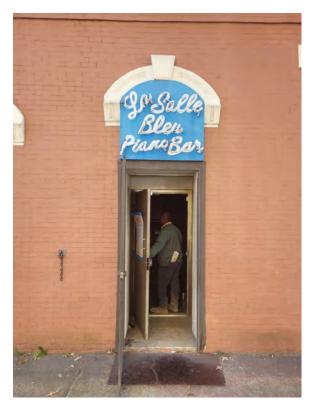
Project area at northwest elevation, 82 Commerce St., 10/24/2024
